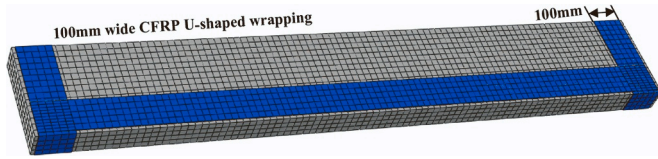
SB-CFRP-reinforced beams with 100 mm wide U-shaped wrapping designed at ends.
